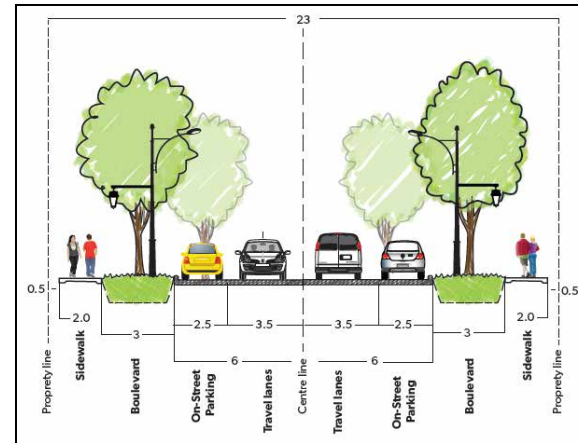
Option 1 – Wintergreen Drive to Bell Street (Annex 5)
